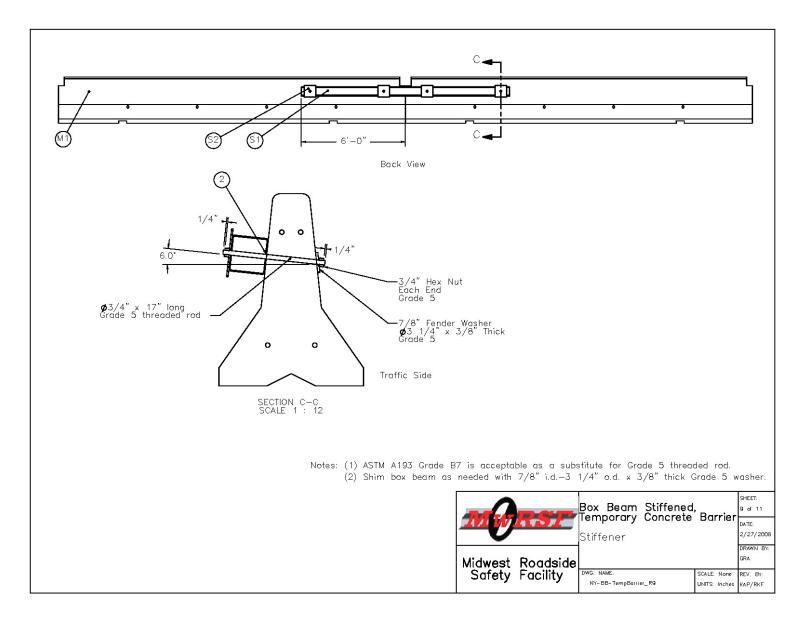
Box Beam Stiffener Details (English), Test NYTCB-1
